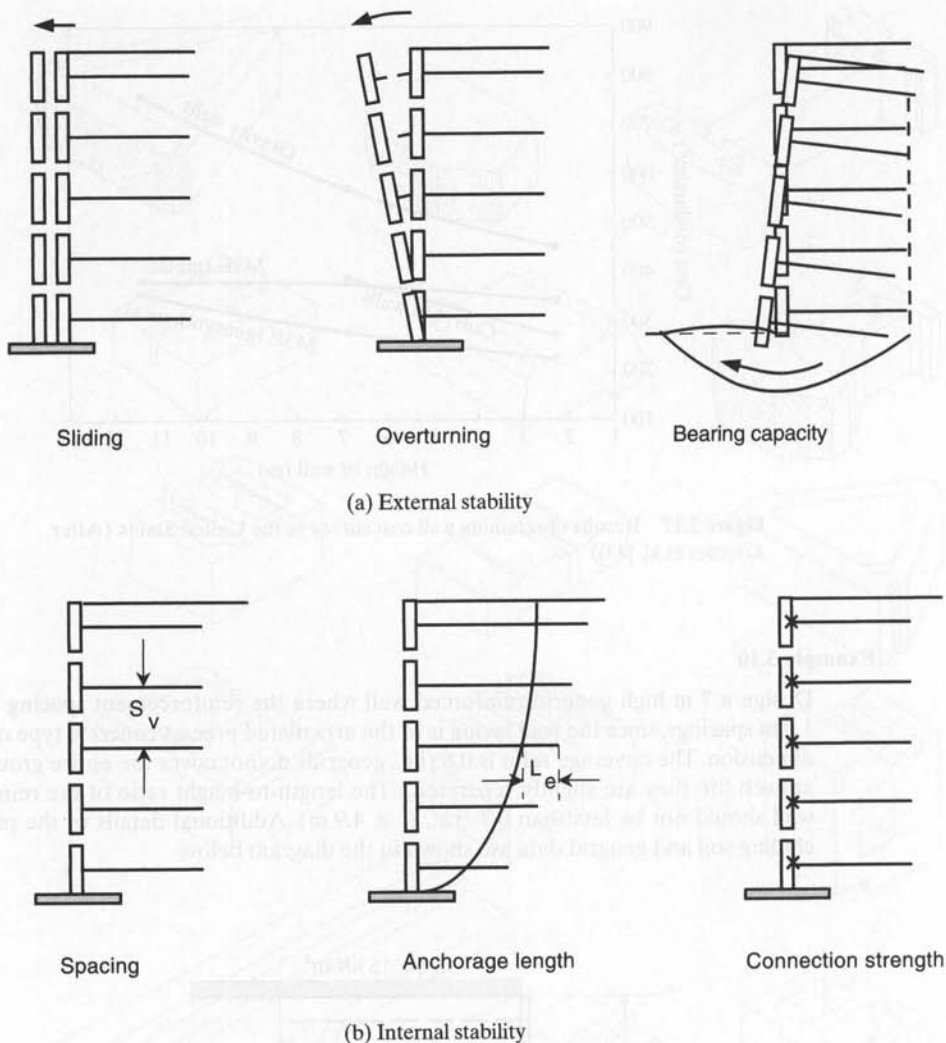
Elements of geogrid (or geotextile) reinforced wall design.
